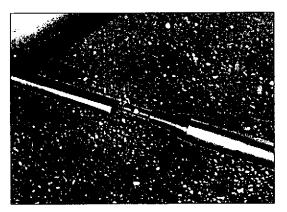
Attach assembled Large Bore Soil Sampler to probe rod.
